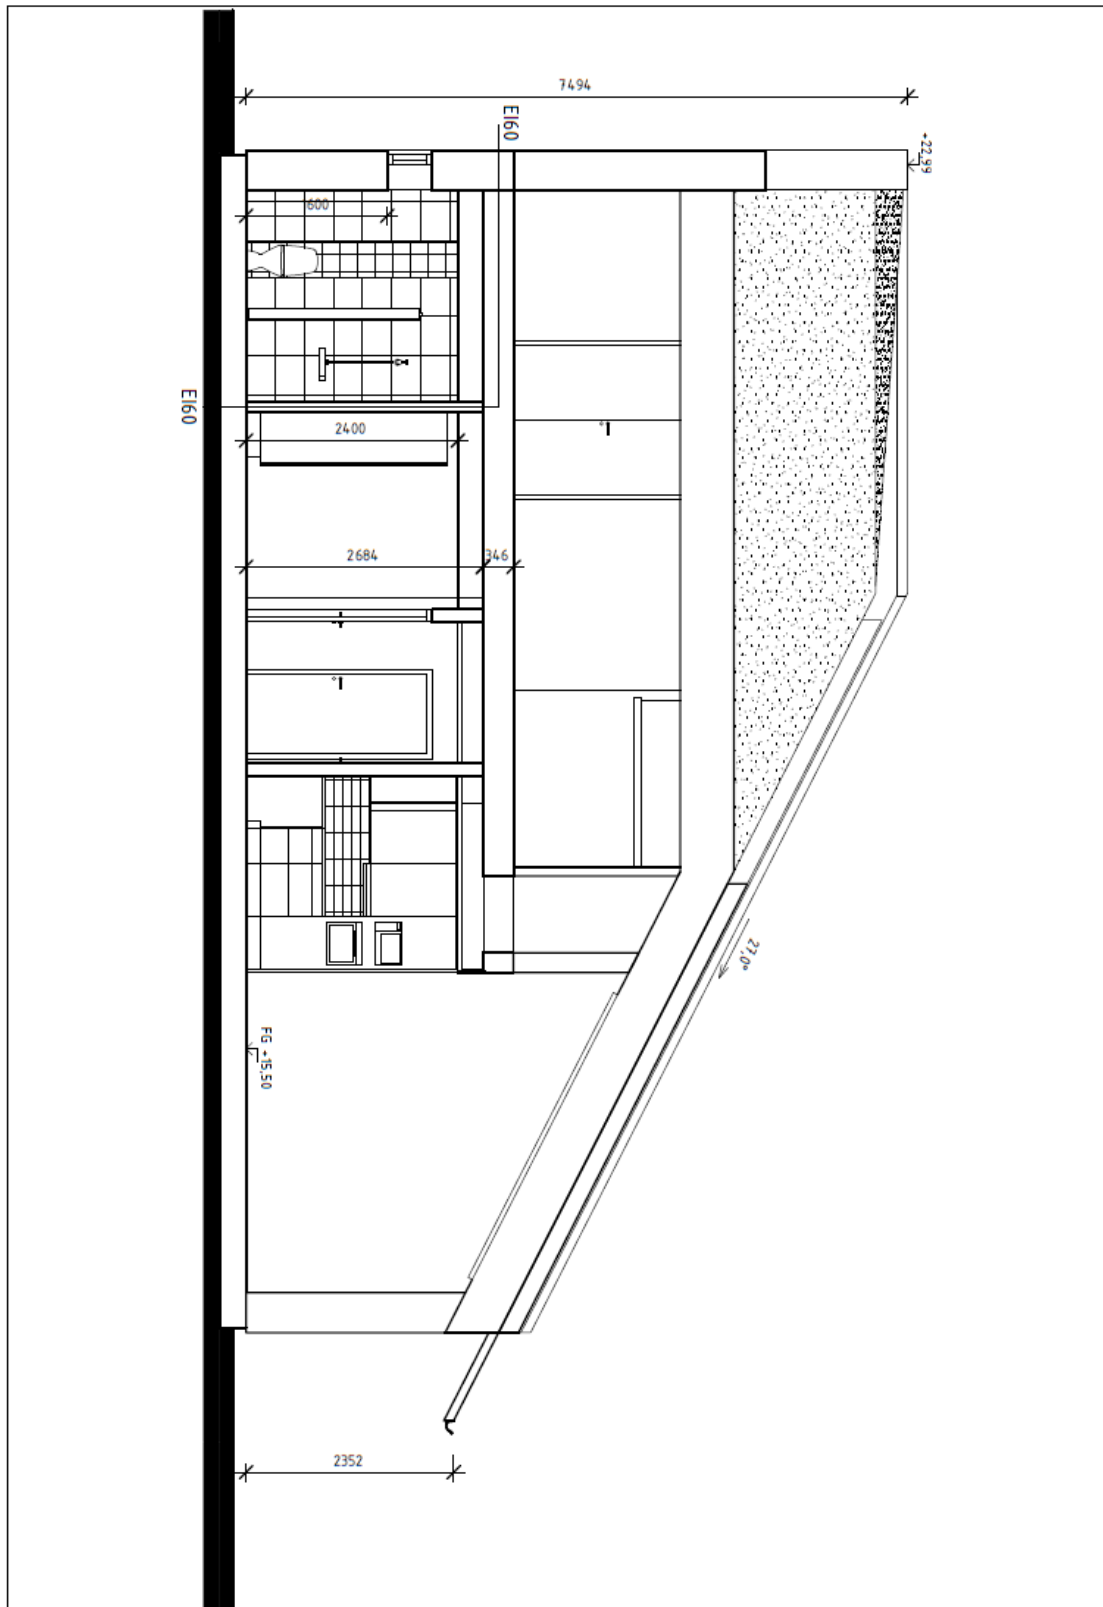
Section B-B, Community building (Architect: Håkan Markgren)..
